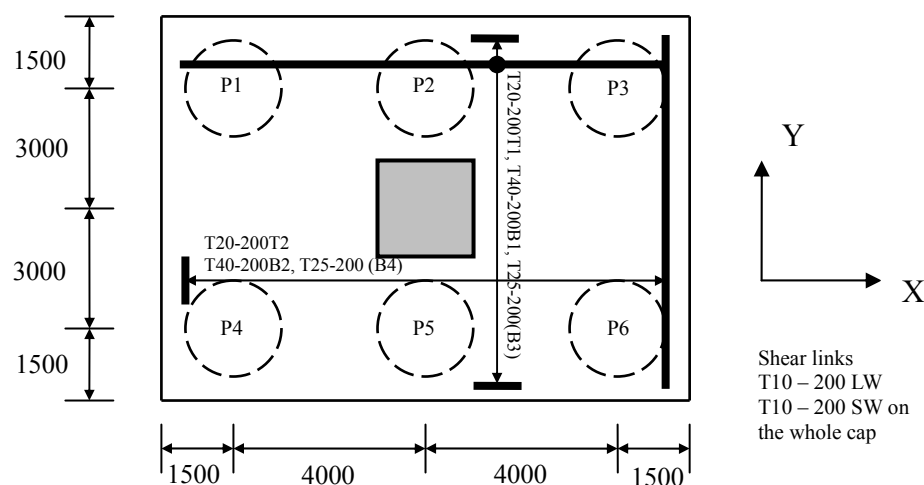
Reinforcement Design of Worked Example 12.1
